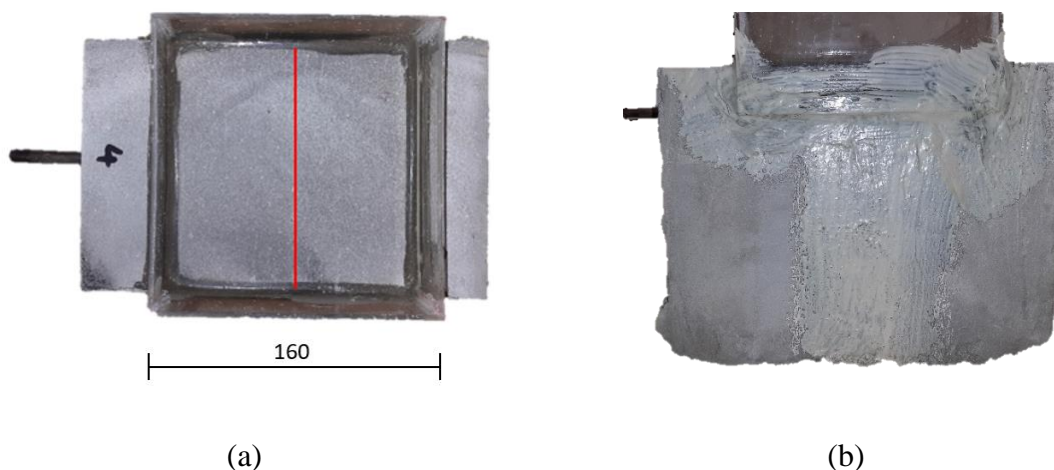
Plan (a) and side (b) view of the 3DPC beam with the saline basin
